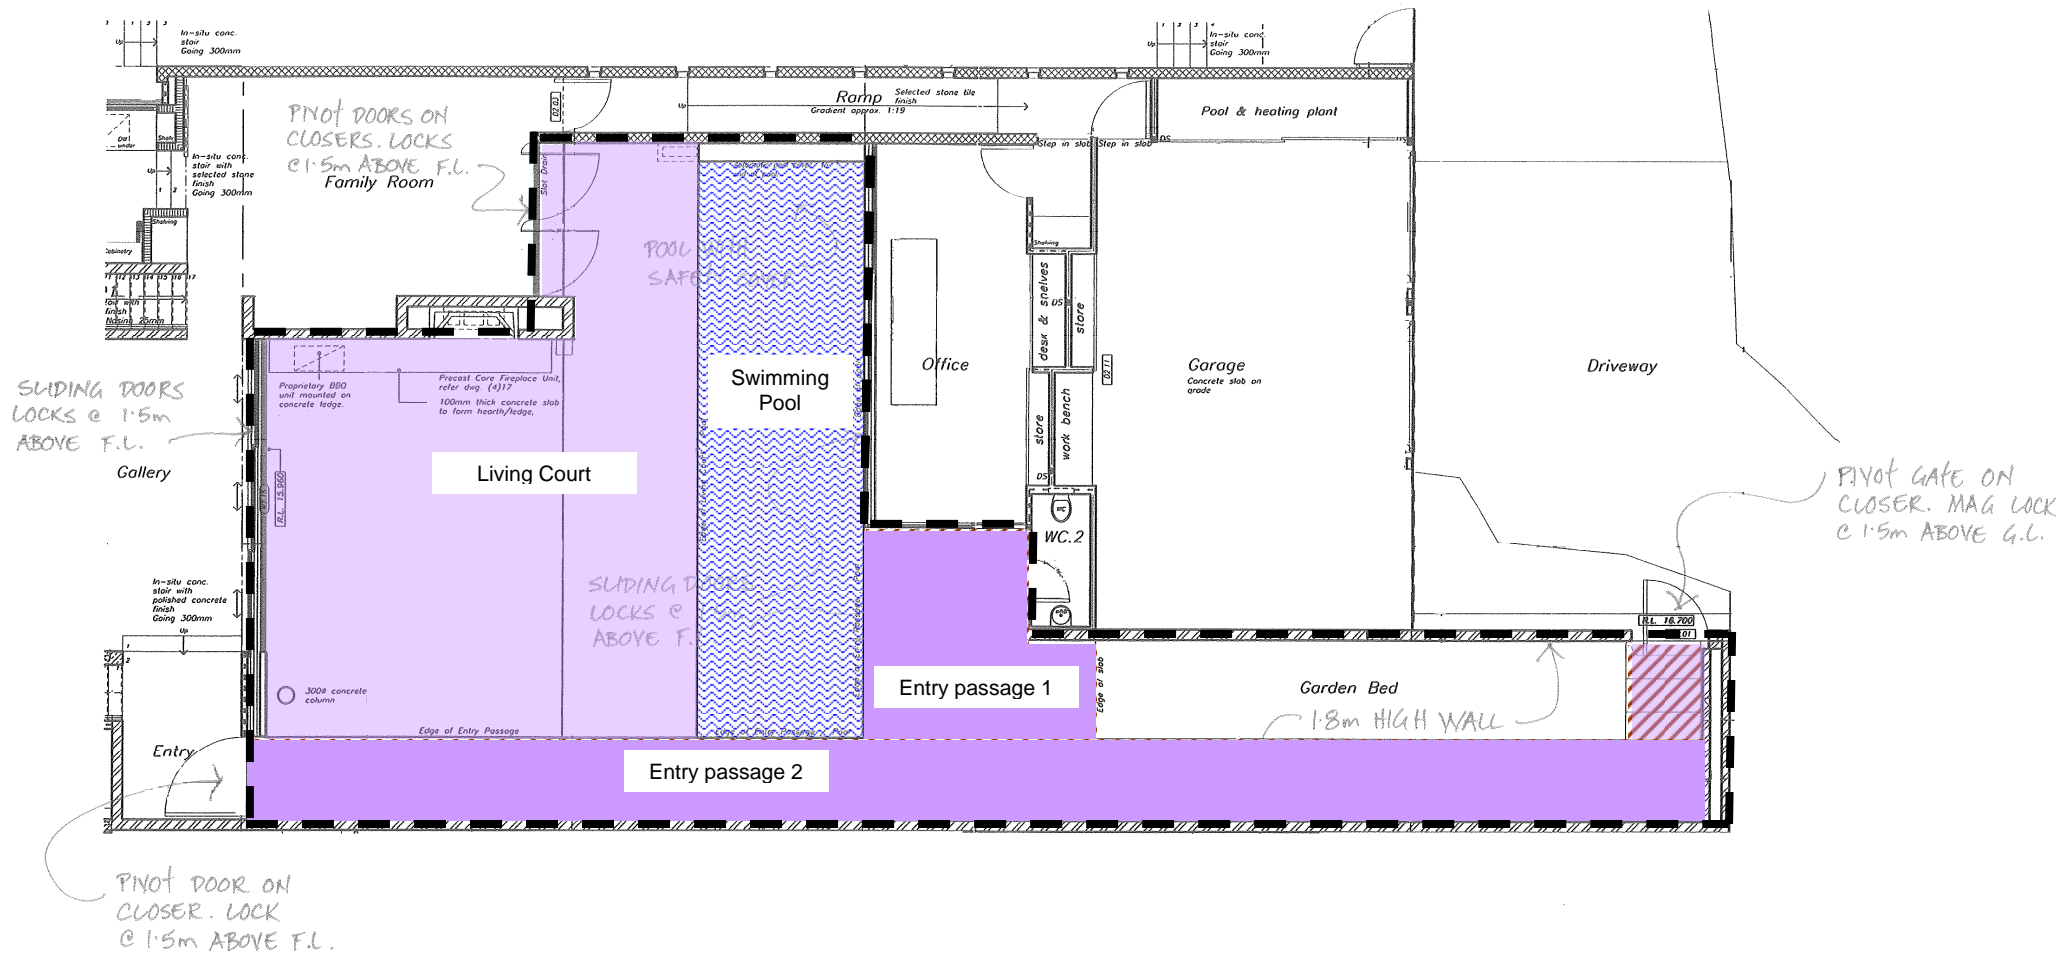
The pool area as detailed in the application for the amendment to the building consent
